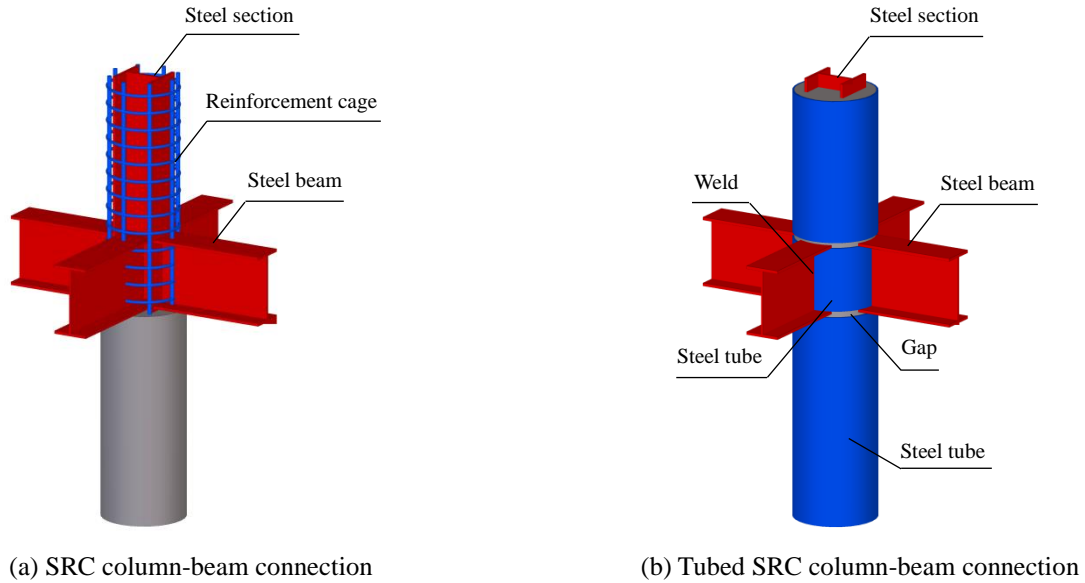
SRC and tubed SRC column-beam connections in structural frames
